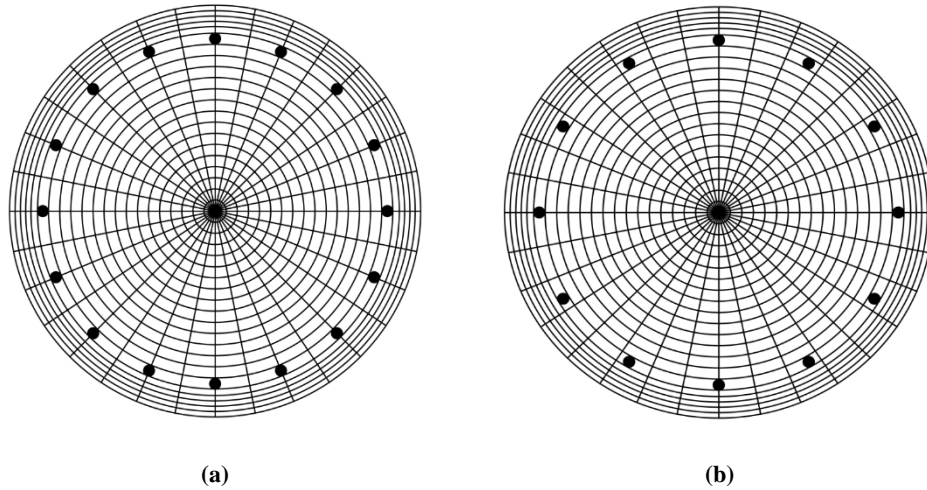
Fiber-section for: (a) Column C1, and (b) Column C2
